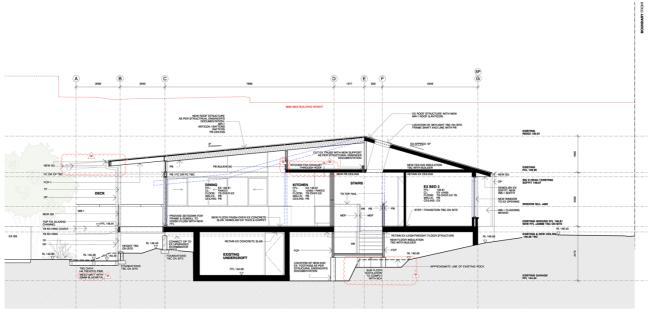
CDC Section BB 11 Jones Street, Beacon Hill
